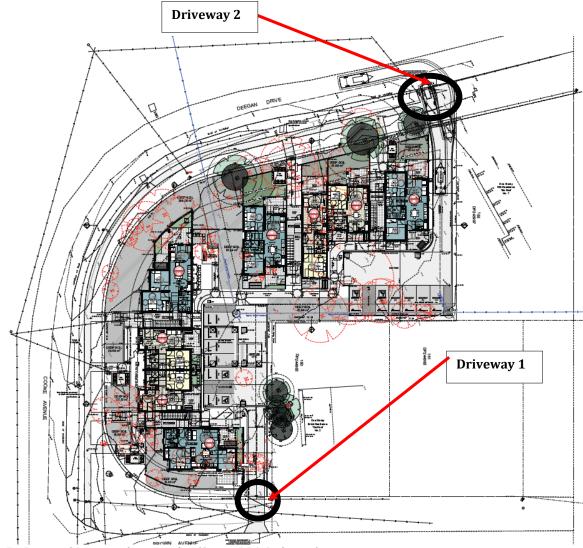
Proposed Driveway location plan (Source DTA Architects)
